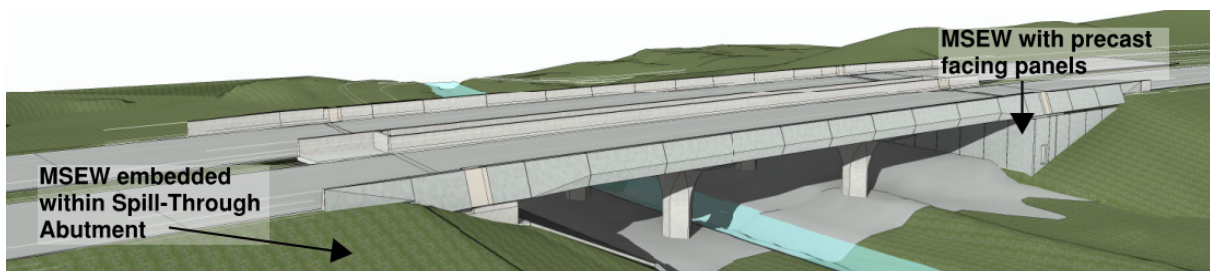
Typical MSE Wall Geometry (Wharemauku Stream Bridge)
